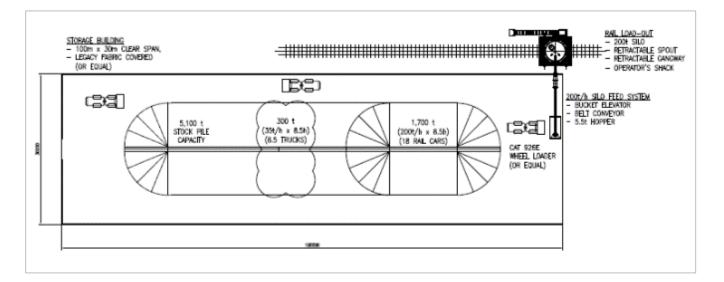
Storage and Rail Loadout – Schematic Layout (Estimated and Indicative)
